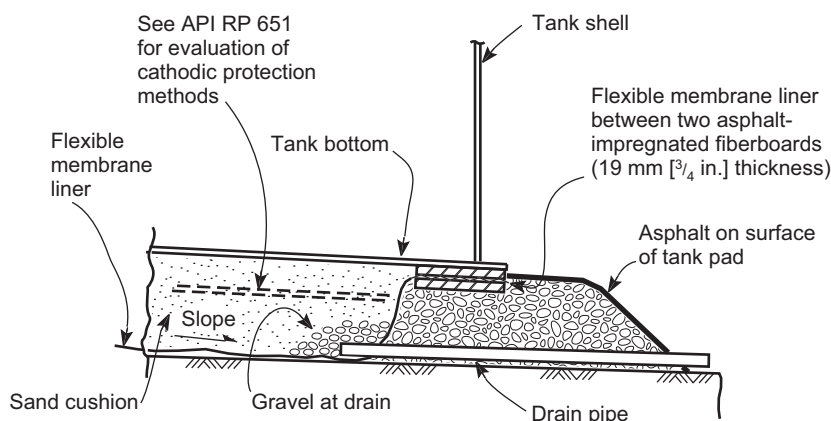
Earthen Foundation with Undertank Leak Detection at the Tank Perimeter (Typical Arrangement)
